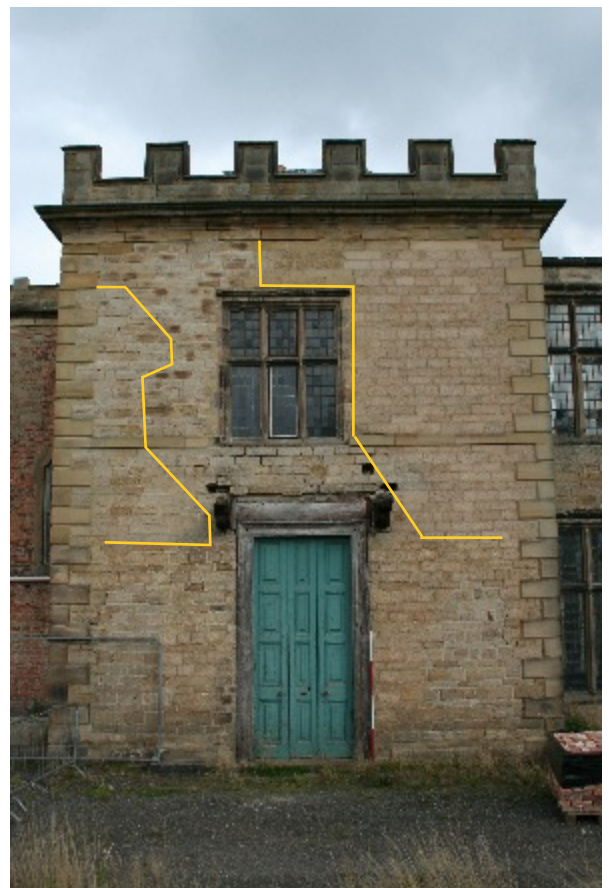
The southern elevation of the east wing and current main entrance, with stonework repair-line in yellow (frame HHR13443)
